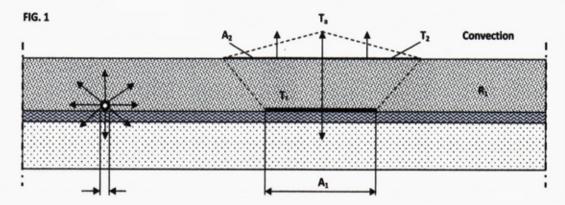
shows a cross sectional area of a floor with a cable or tubing and EP Warmfloor flat element.
